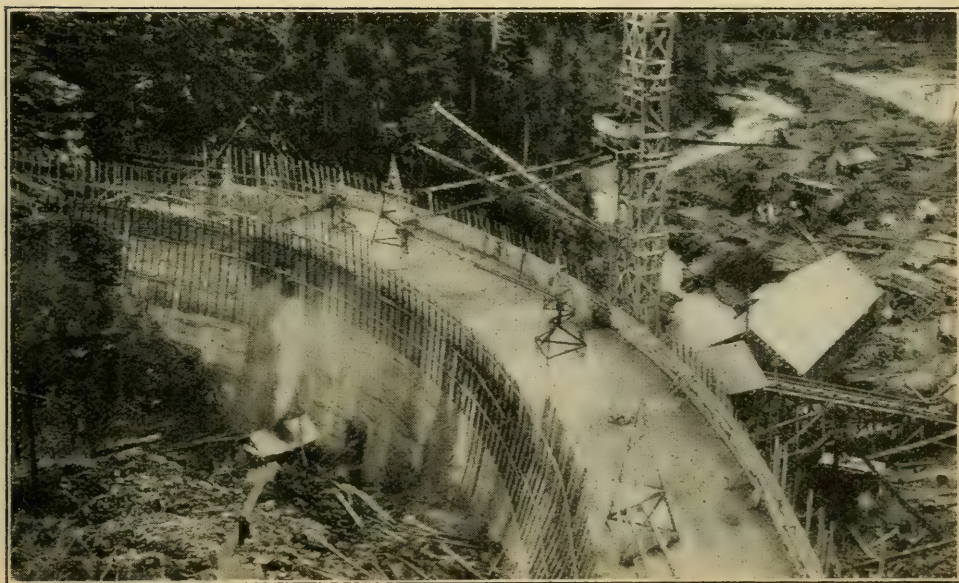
SALMON CREEK DAM, SHOWING CONSTRUCTION TOWER AND FORM WORK.
